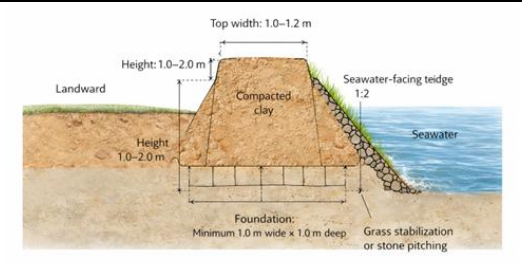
Cross-sectional design of a seawater control bund showing foundation depth, side slopes, and protective reinforcement.
